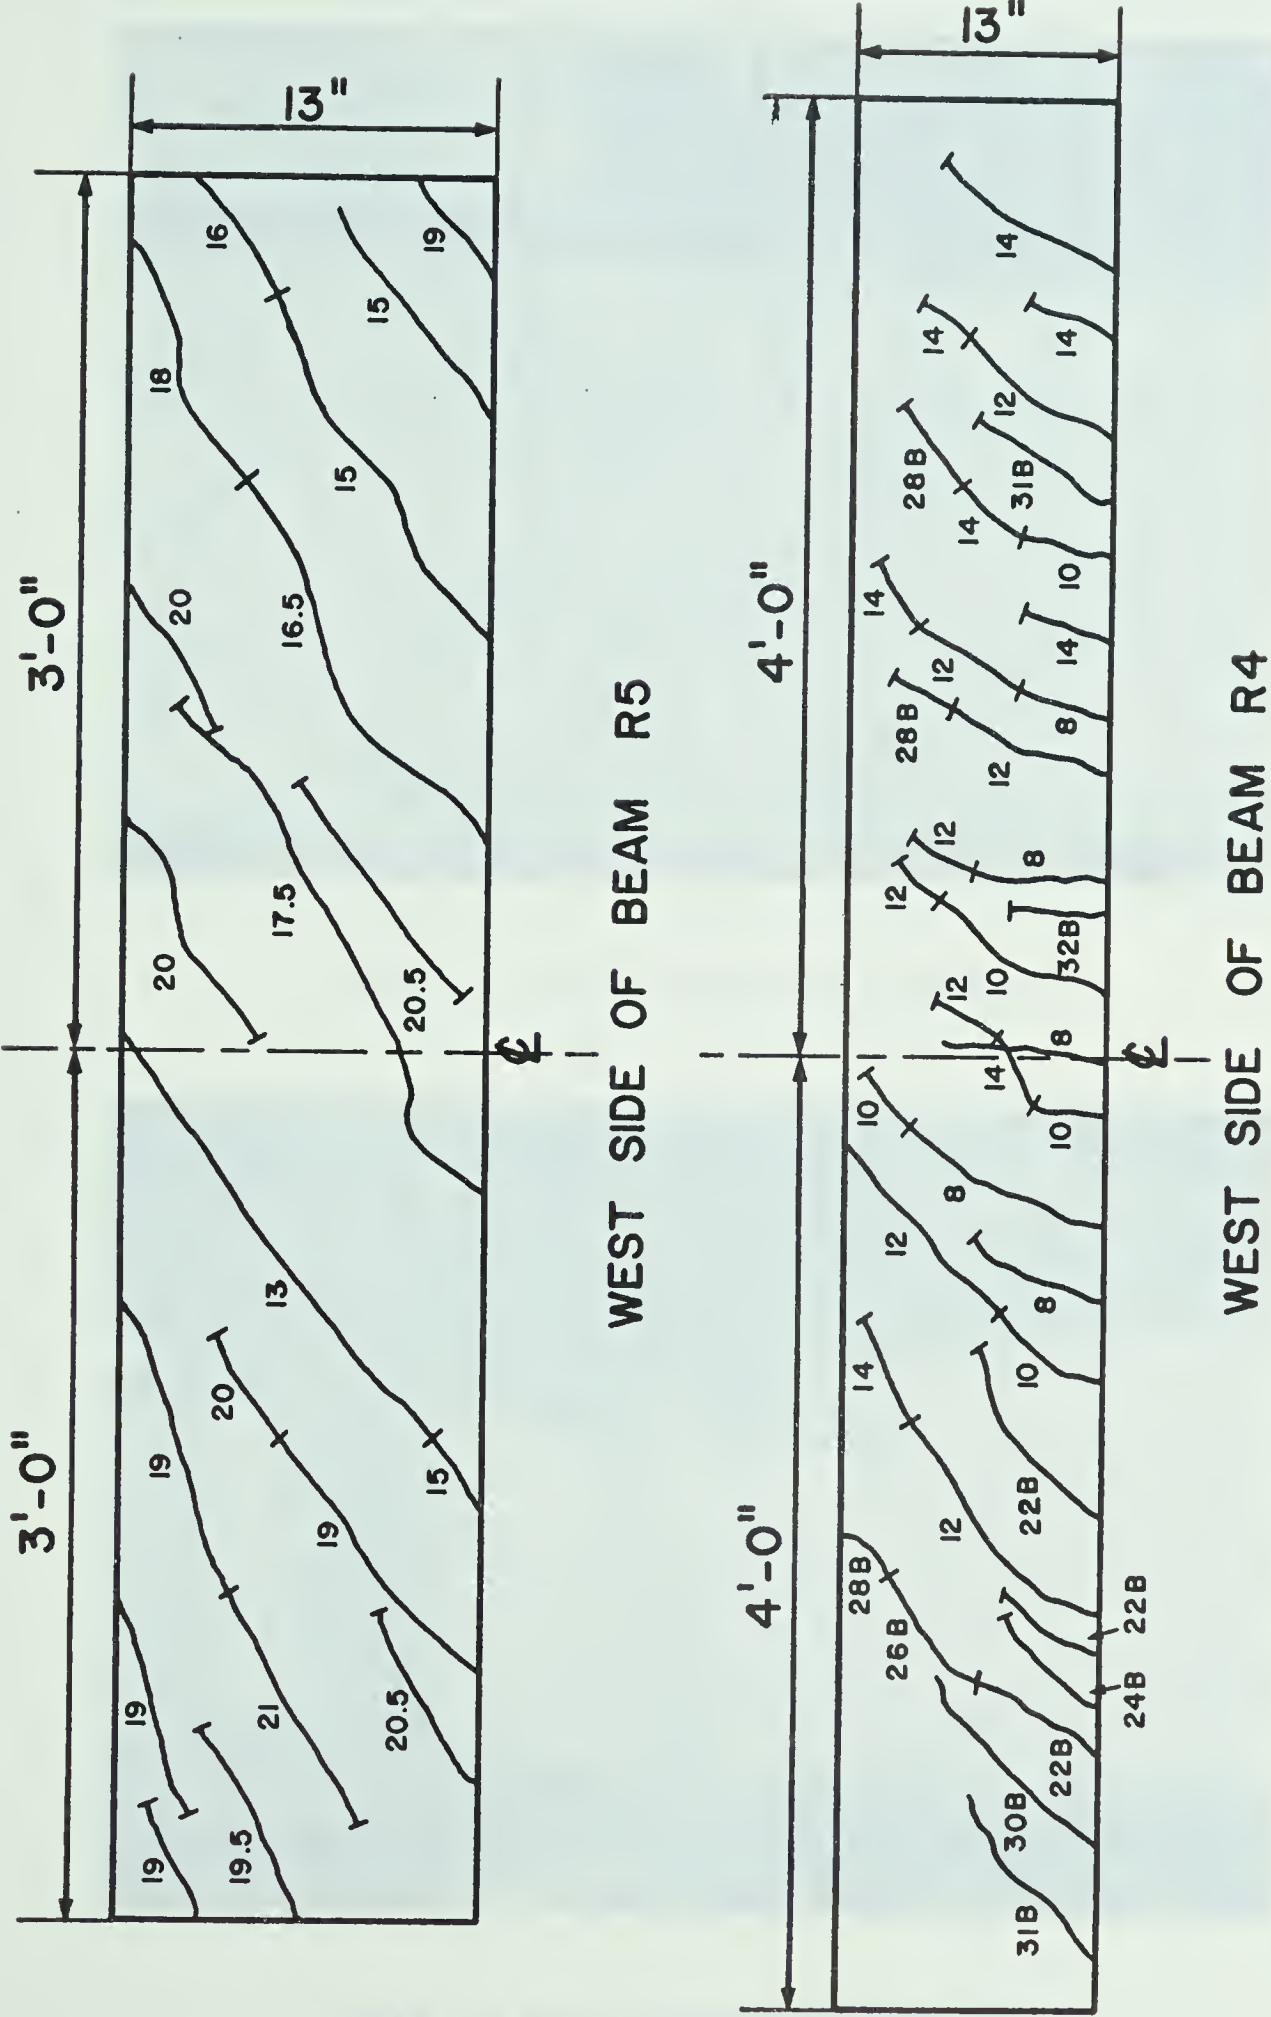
CRACKING PATTERNS FOR BEAMS R4 AND R5
